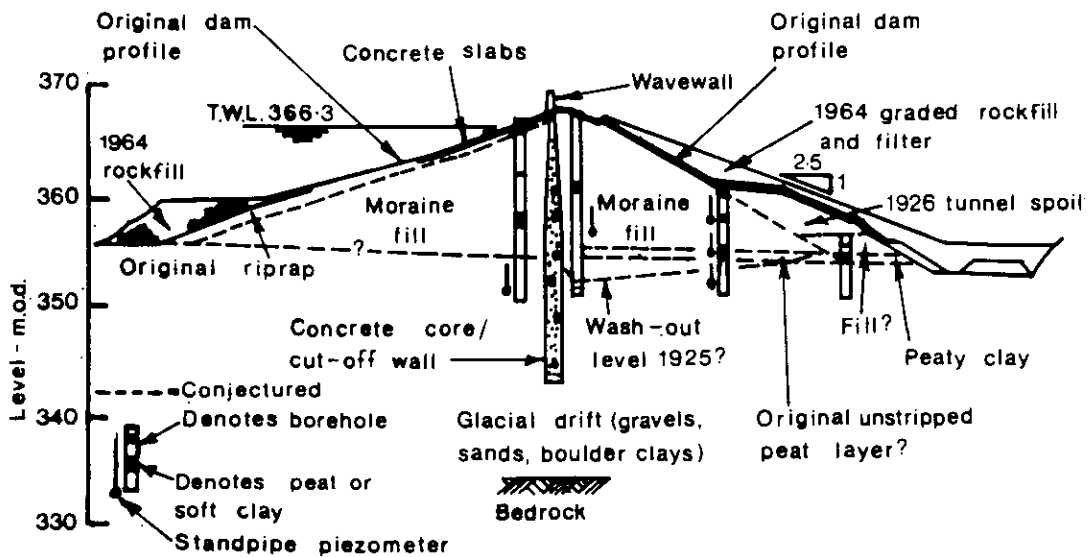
Dam Cross-Section C-C, showing Original and Subsequent Profiles
